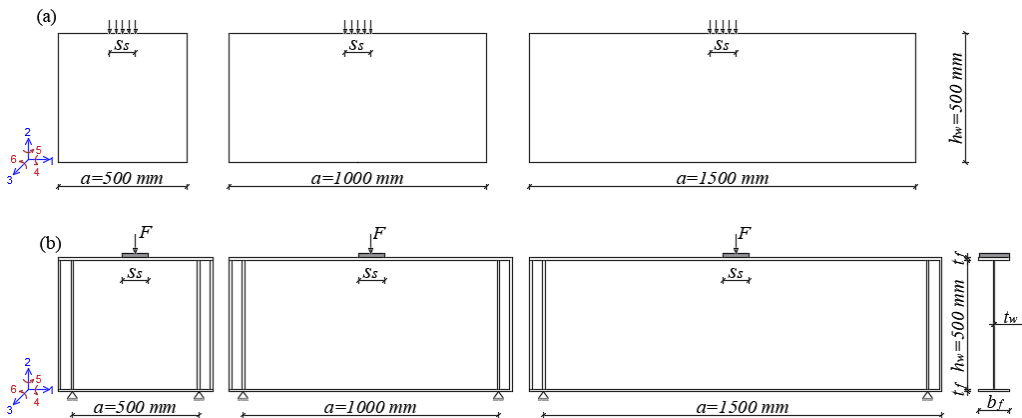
(a) Plate under patch load; (b) I-girders under patch load
